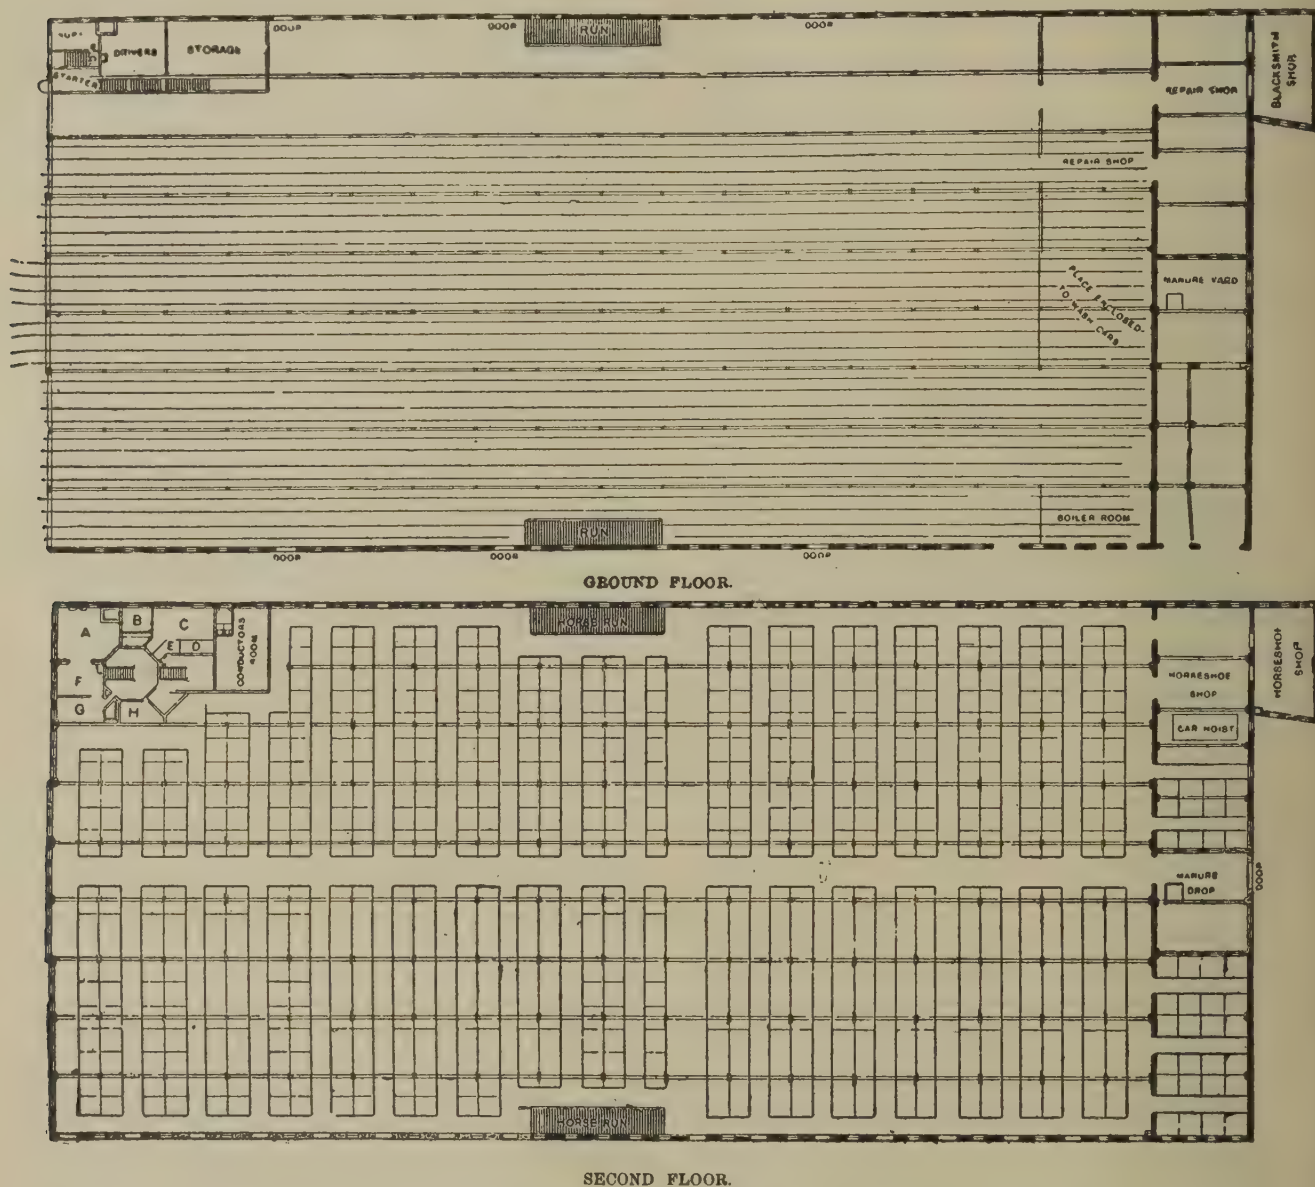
PLAN SHOWING CAR HOUSE AND STALL ARRANGEMENT IN CITY STABLE.
